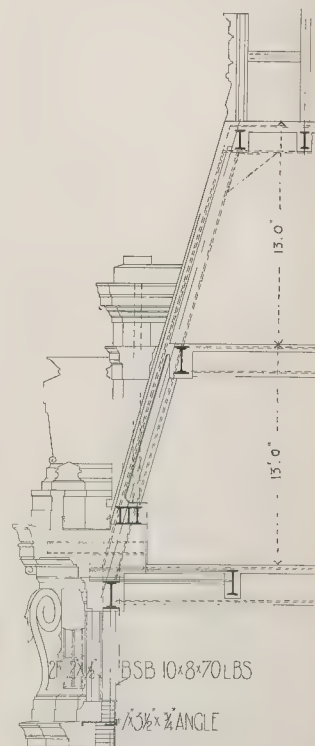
Section showing Steelwork in Main Cornice, Mansard Roof, and Parapet.
